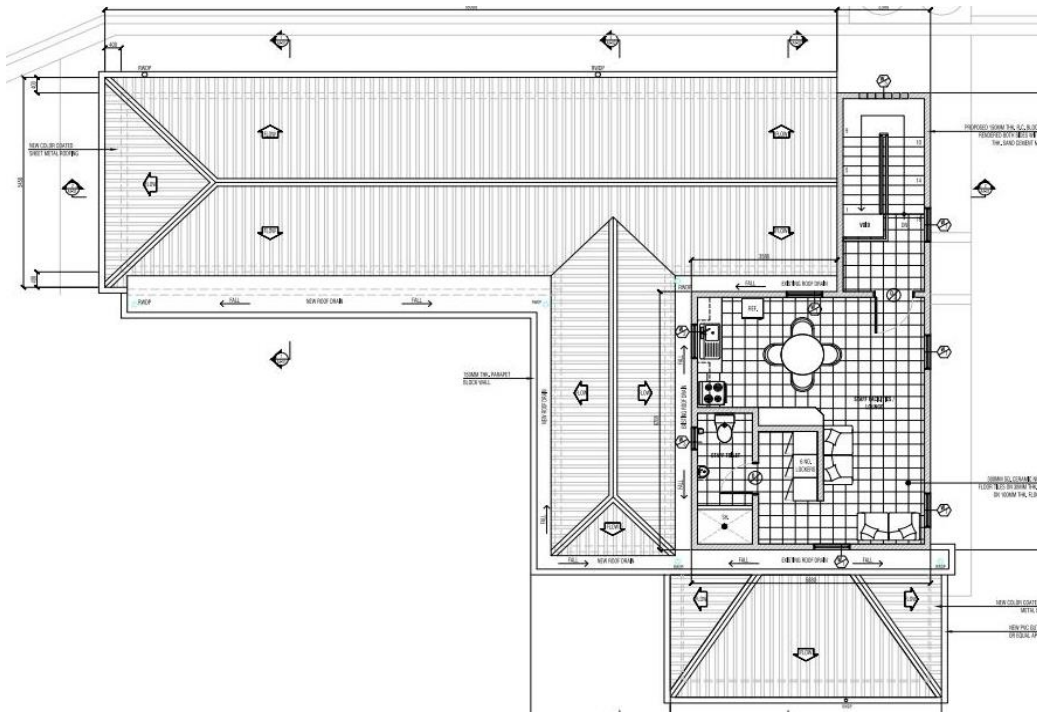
Proposed First Floor Layout (Source: compiled by author)
